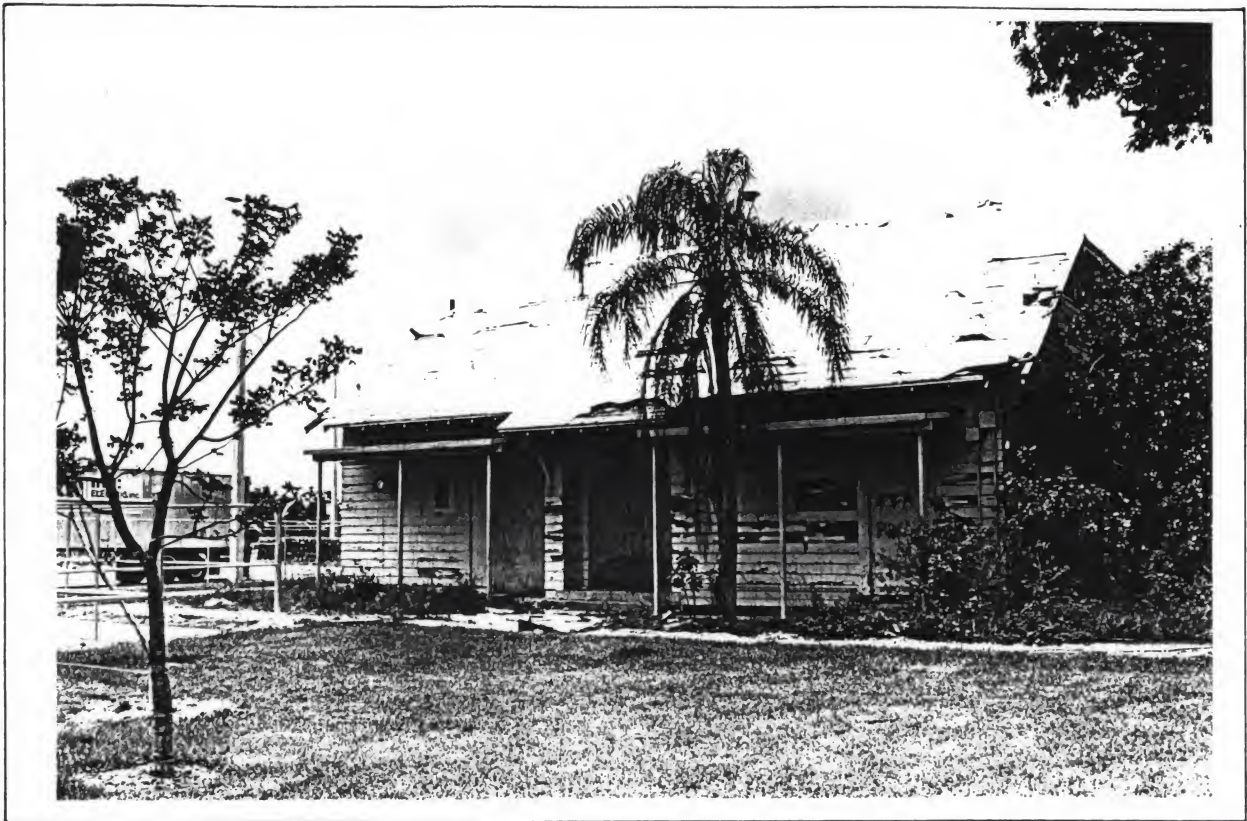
AGRICULTURE BUILDING, SOUTH (ENTRANCE) ELEVATION.
